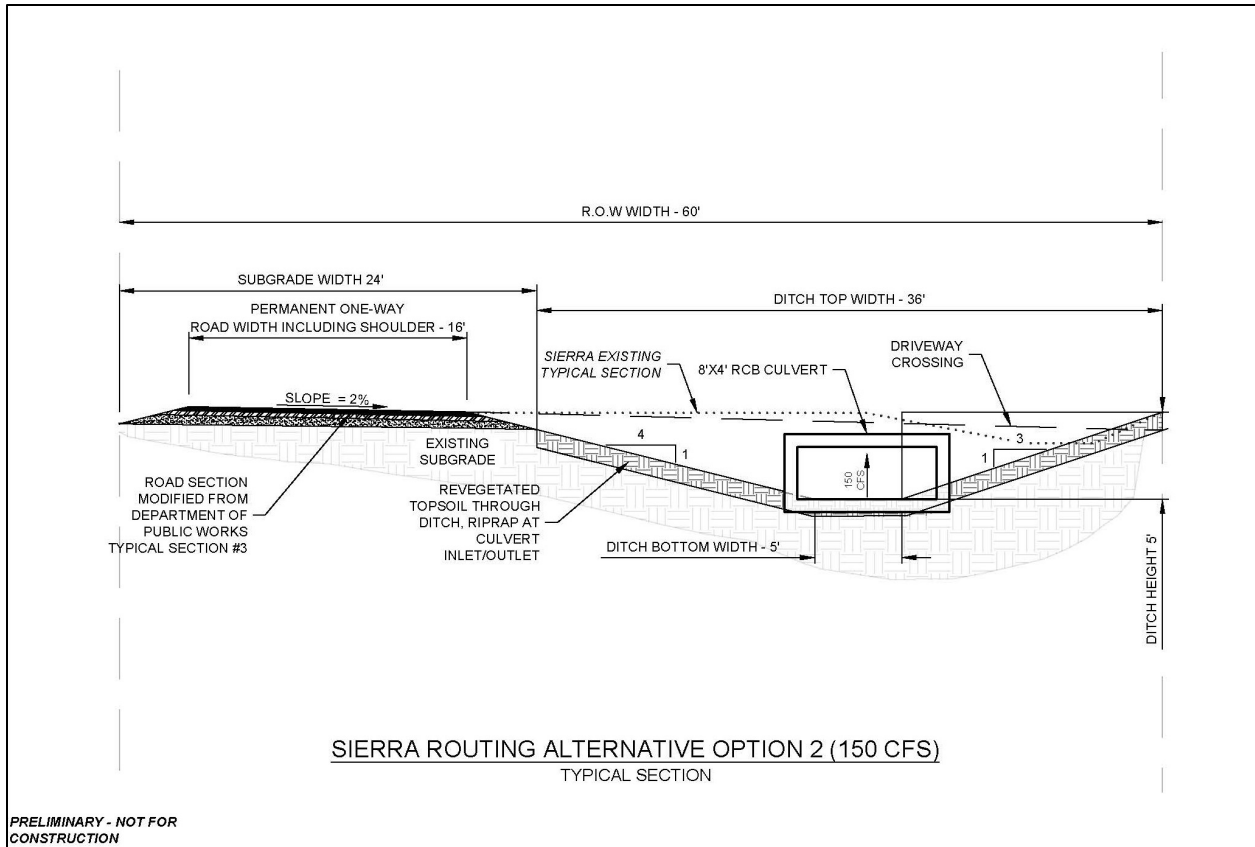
Typical section for the roadside ditch and RCB culvert layout for Sierra Routing Alternative Option 2.
